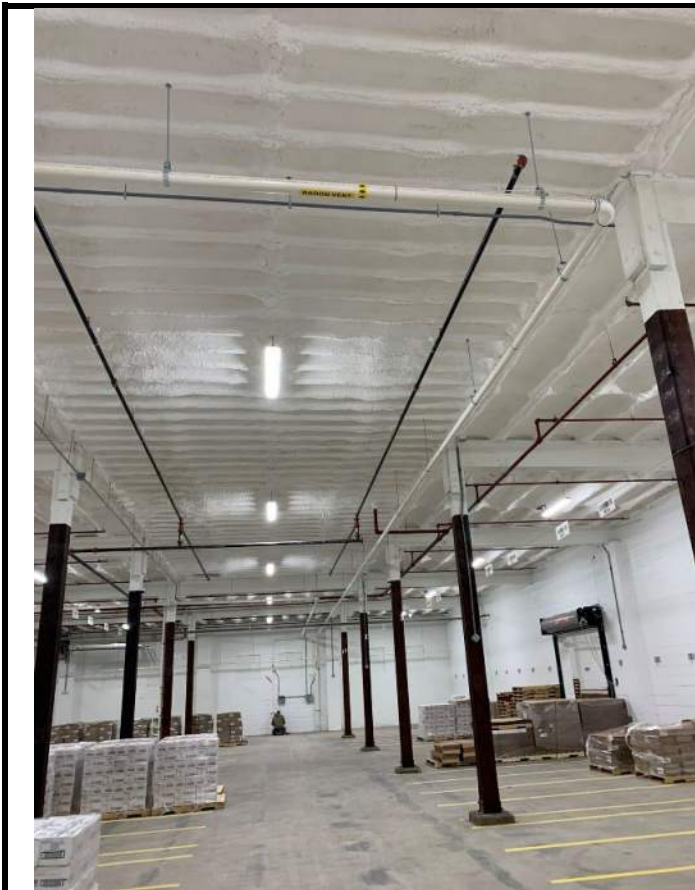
PVC horizontal piping connecting the extraction point to the moisture discharge point.
